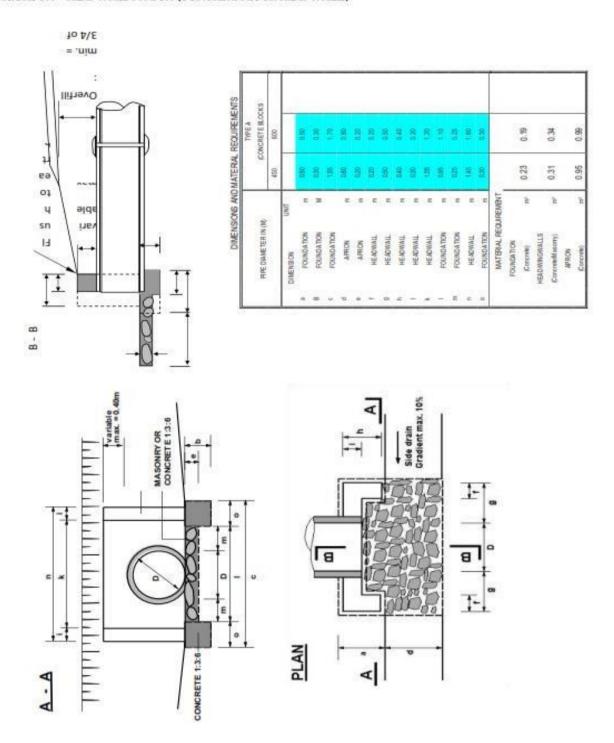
HEADWALL TYPE 3B (STONE MASONRY HEADWALLS)
